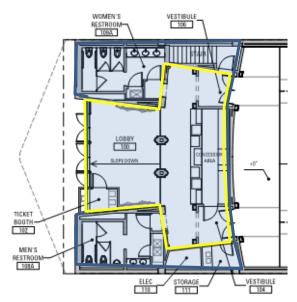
Detailed floor plan of existing lobby area, with the lobby's T-shaped plan outlined. Source: BAR Architects, October 31, 2019, edited by Page & Turnbull.
